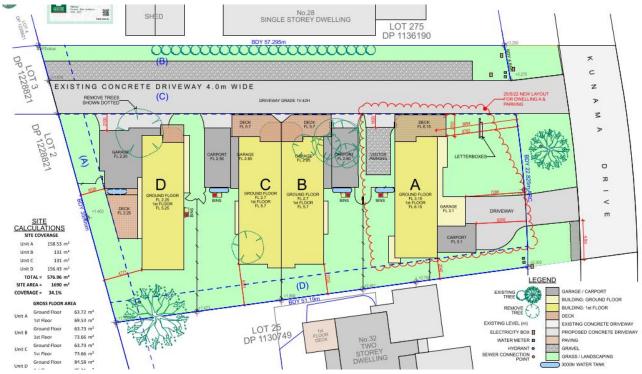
Superseded Site Plan - DA 10.2022.60.1
